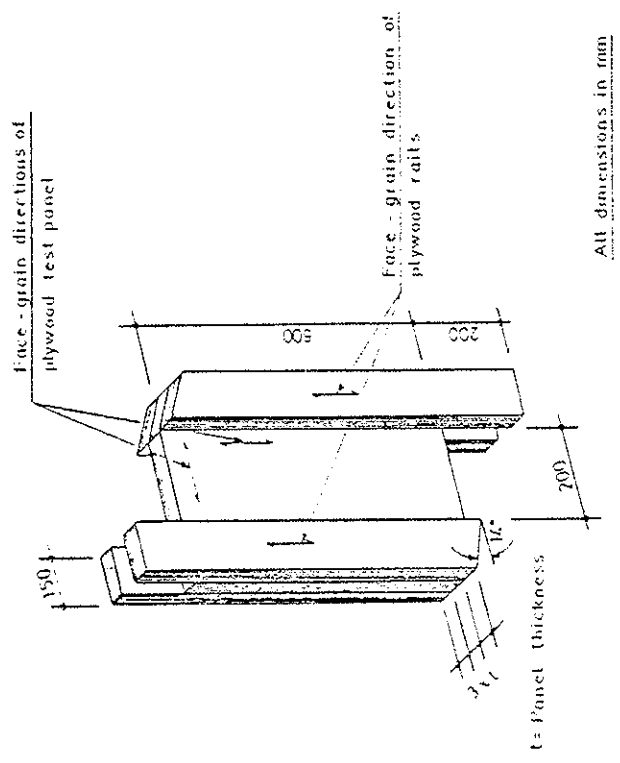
Modified Test Specimen with Plywood Rails of Same Thickness as Test Panel
